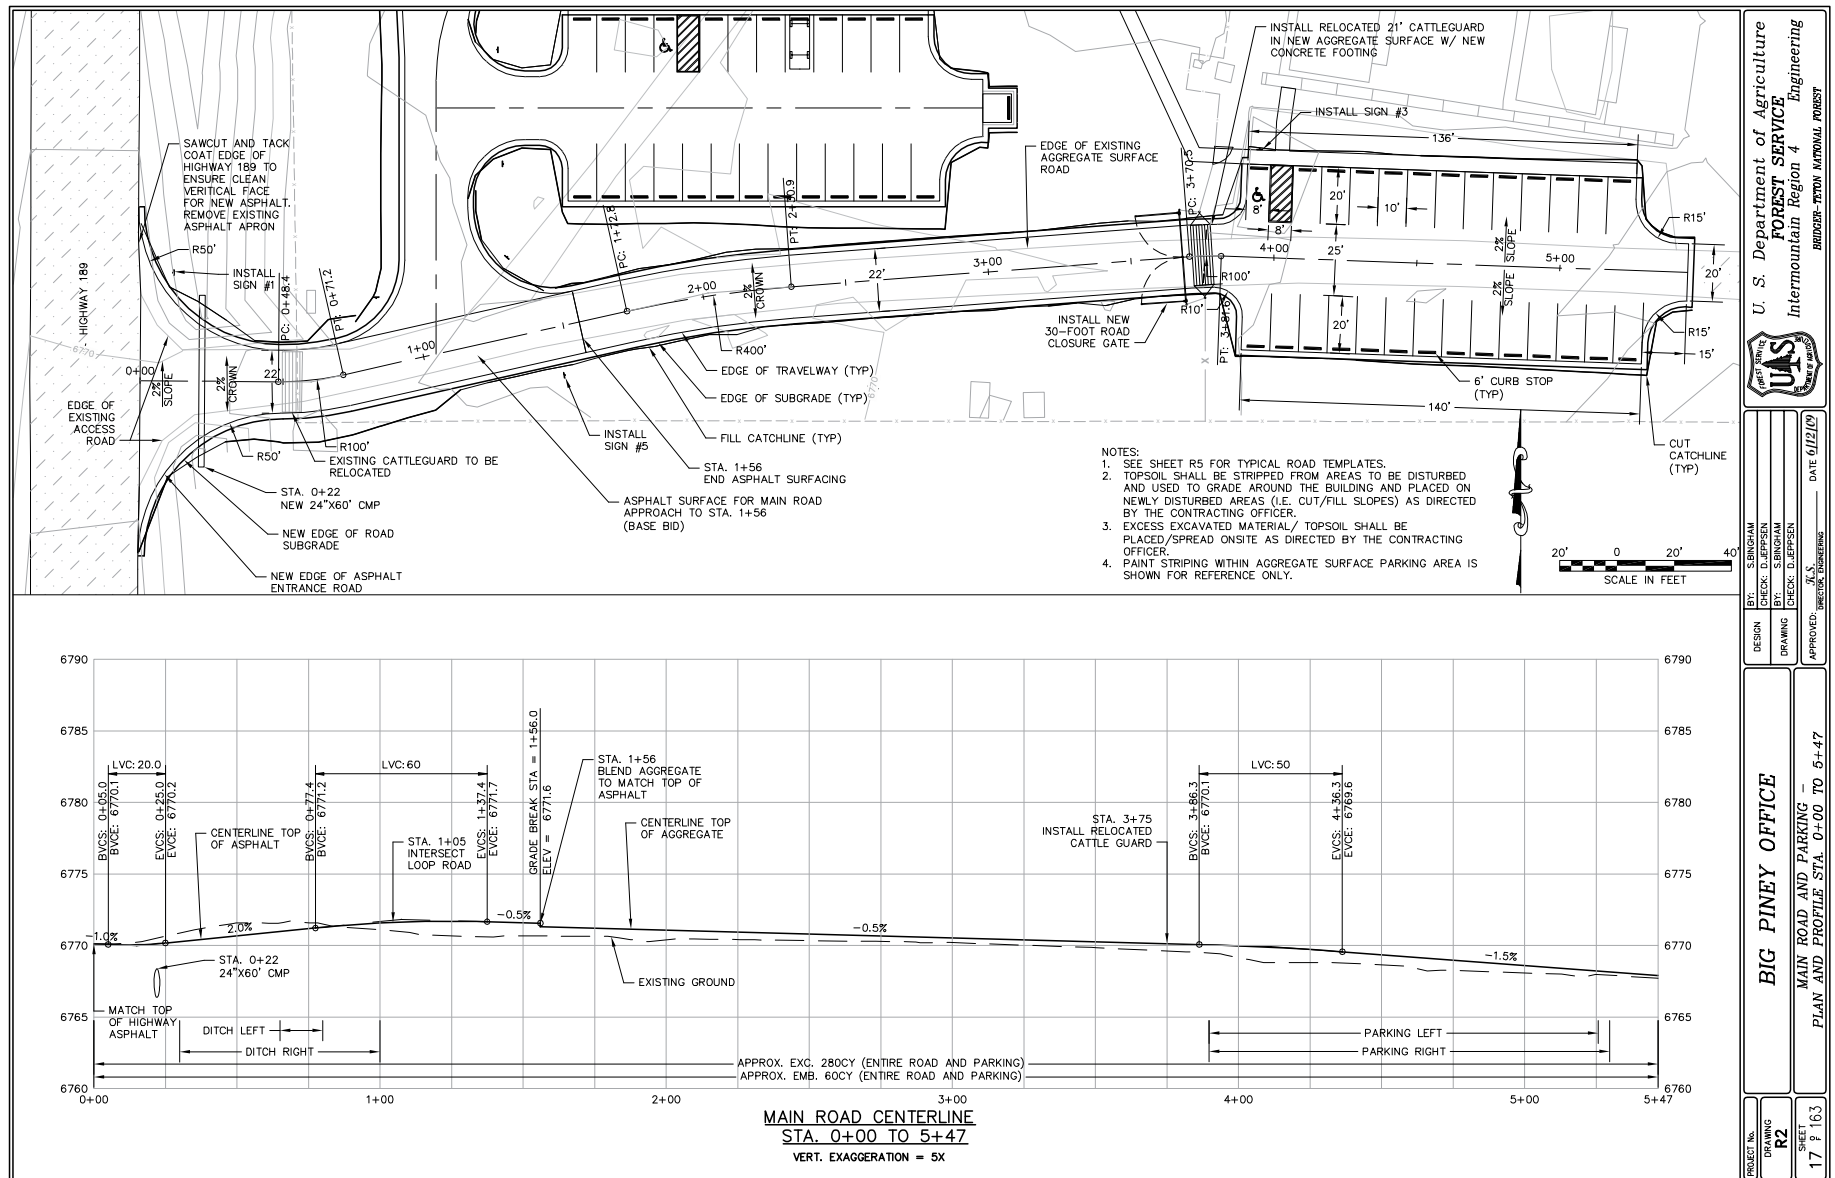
Example of a final grading plan showing the plan view and finish-grade elevations. The plan is of the Big Piney Office on the Bridger-Teton National Forest.
